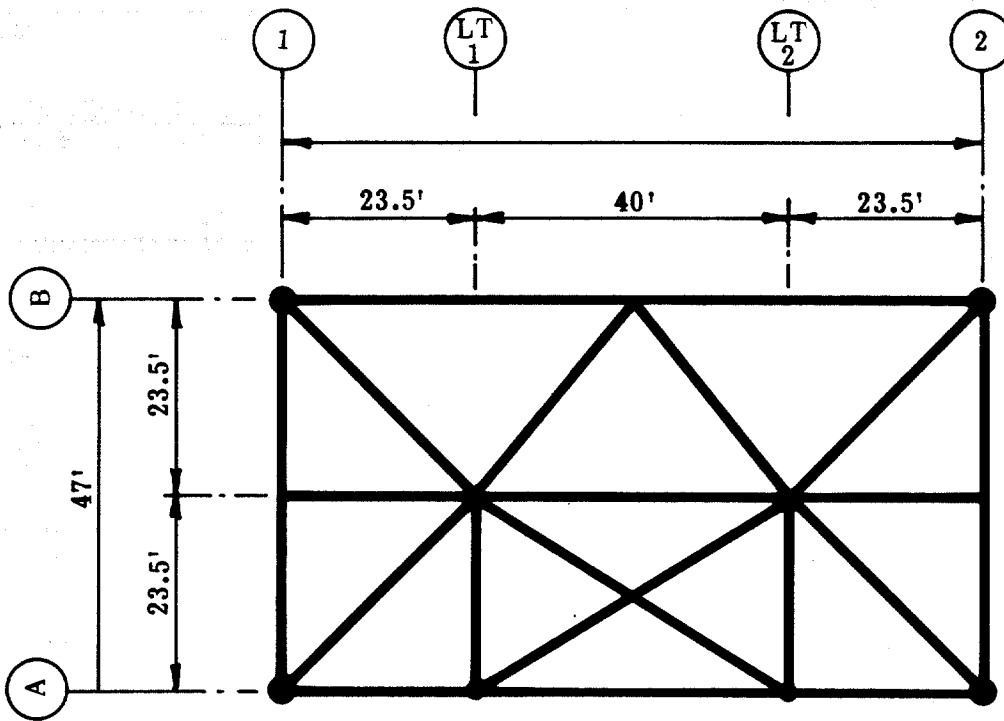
MULTIPLE JACKET CASE, 150 FT WATER DEPTH, LEVEL 1 @ ELEVATION -150 FT
